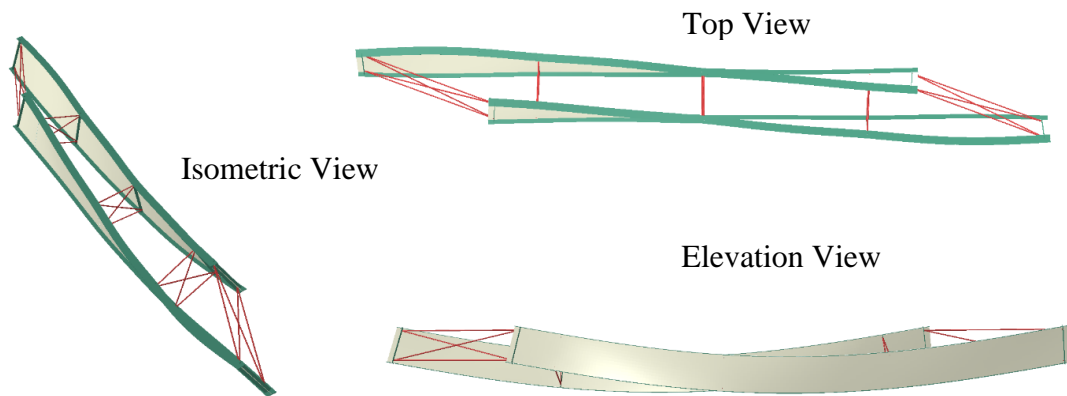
Magnified girder deflections for two straight I-girders, simply-supported on skewed bearing lines at their ends, and subjected to vertical load after interconnecting the girders by cross-frames.
